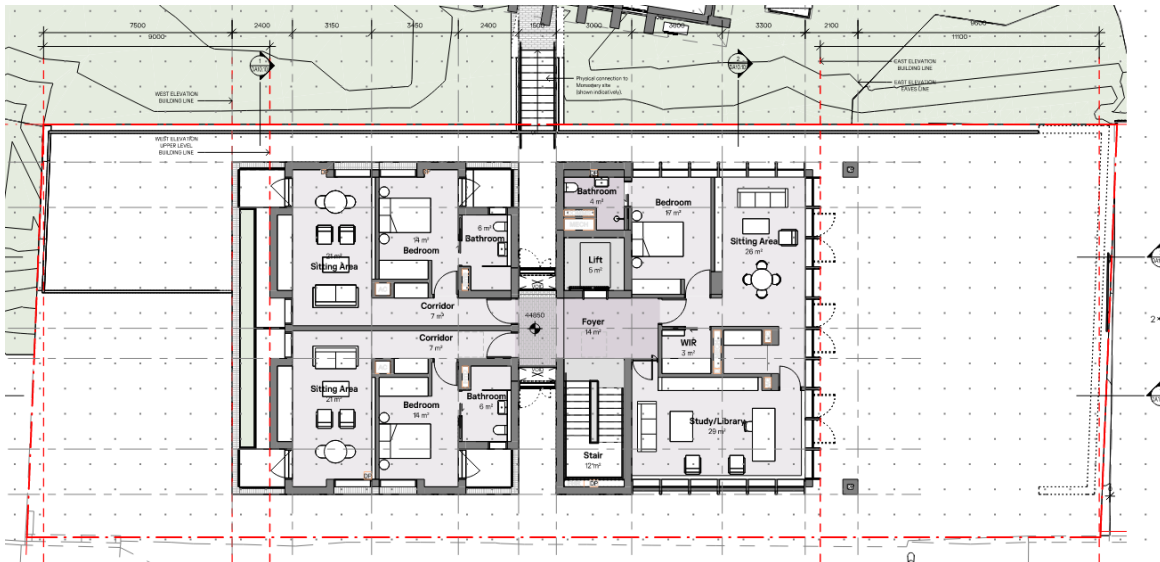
Level 2 (Source: Architectural Plans – Cortese)
